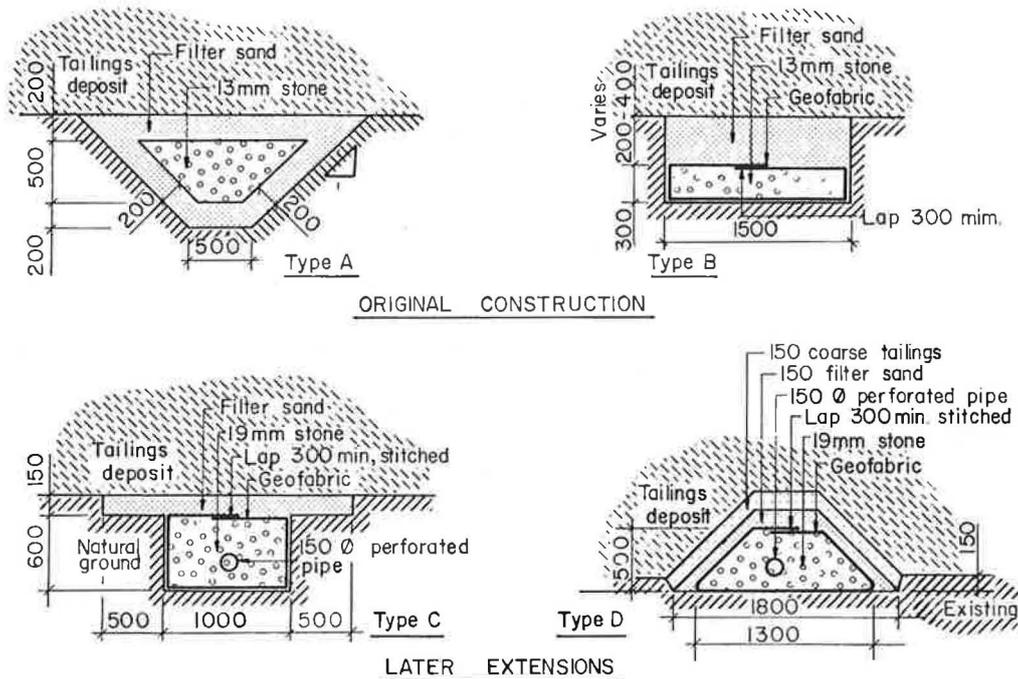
ERGO Tailings dam - Typical filter drain details
